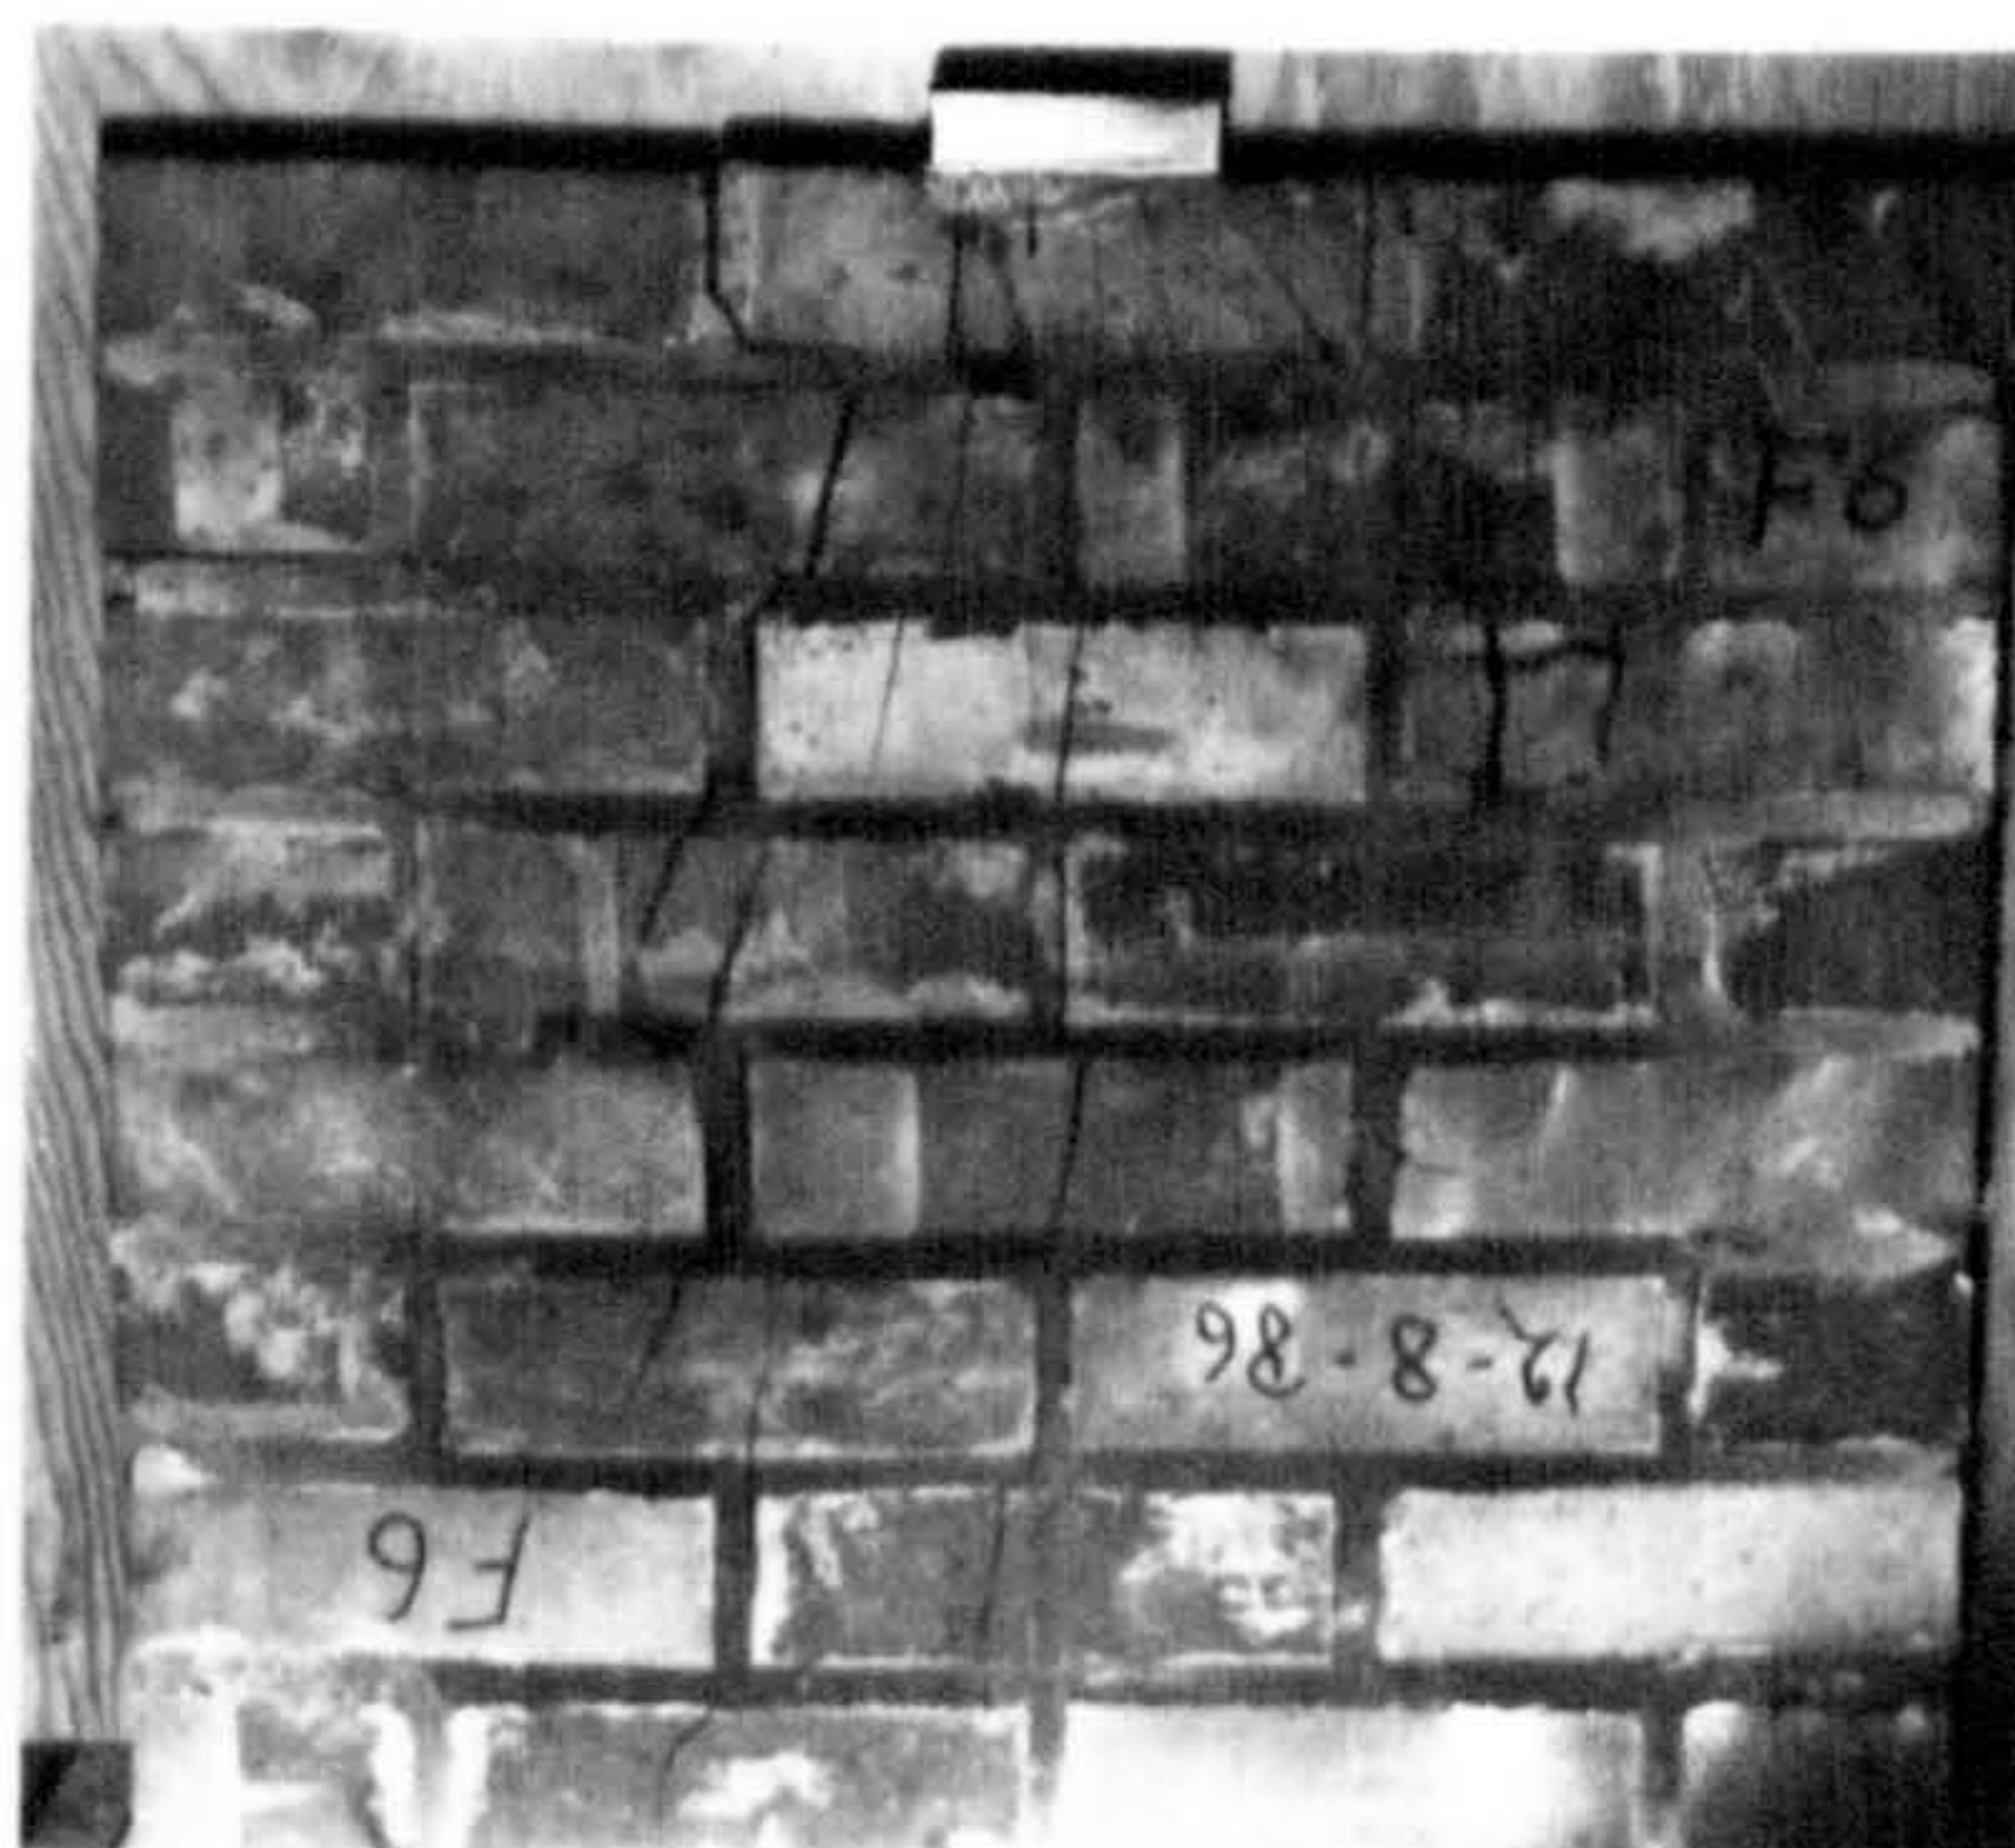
Typical failure mode and crack pattern for brickwork type E under central strip loading ( $t=102.5\text{mm}$ ).
